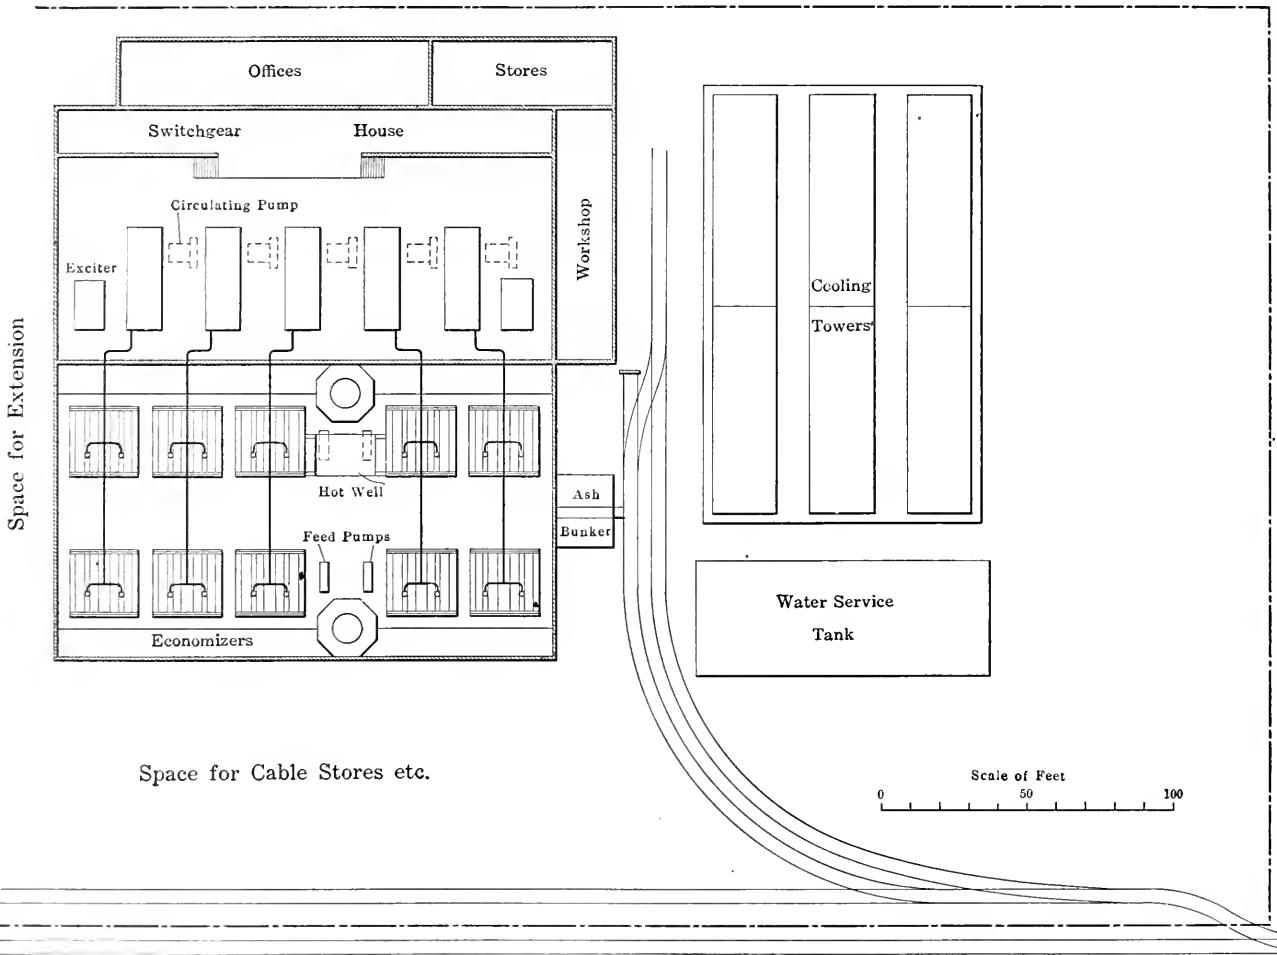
PLAN OF 10,000-KILOWATT STEAM PLANT
